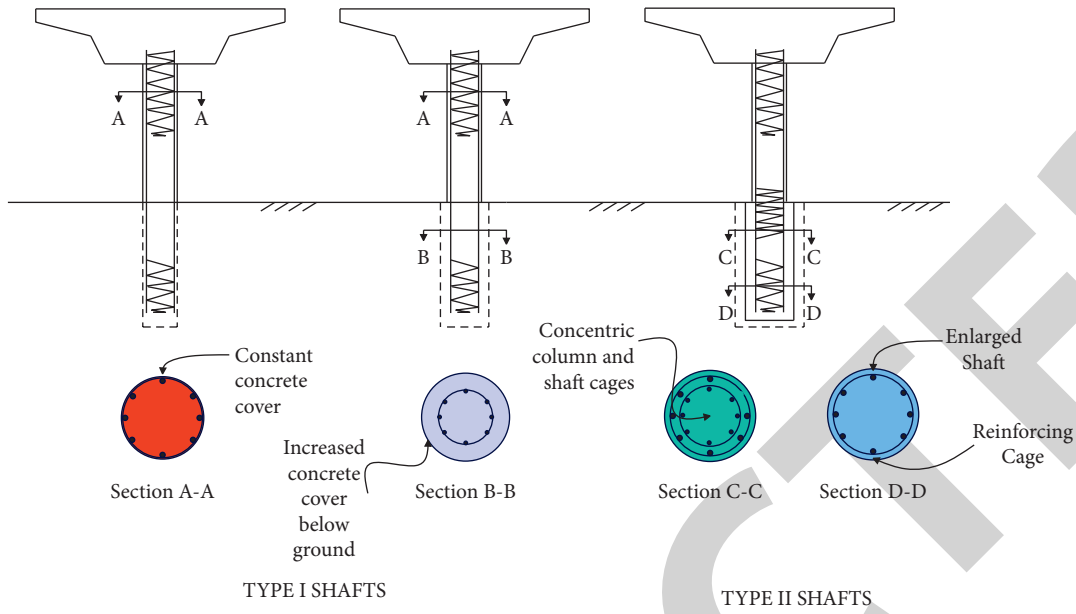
Main forms of bridge piers in the Caltrans specification in the United States.
